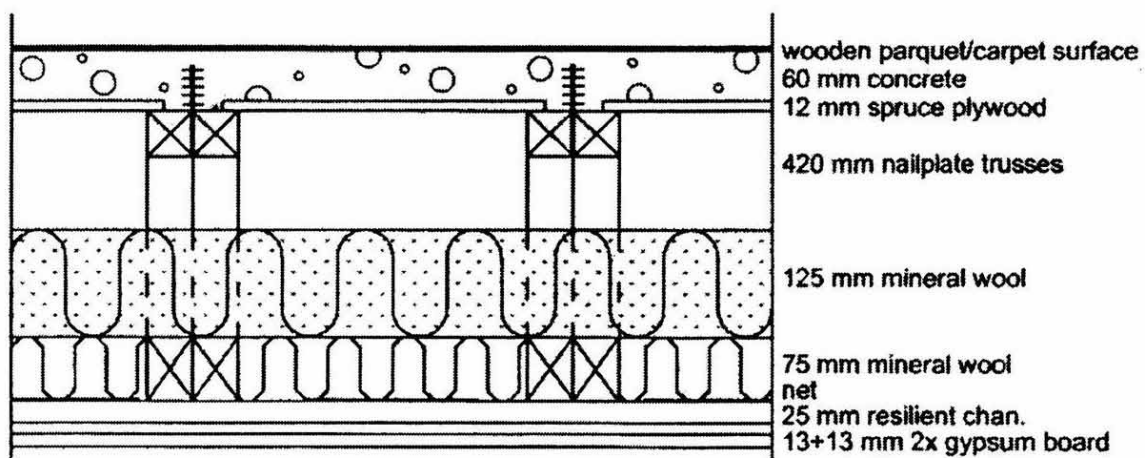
Composite wood-concrete floor system developed by Sepa Oy, Finland. Truss joists are used with the top nail plates protruding above the joist. A reinforced concrete layer is then poured over the floor. The concrete then bonds to the joists through the protruding nail plates.
